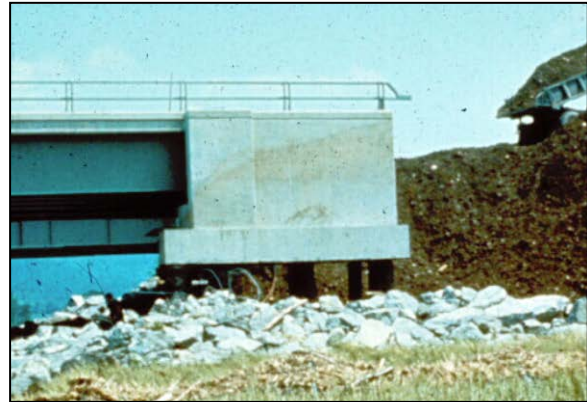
Exposed Timber Piles at Scoured Abutment
